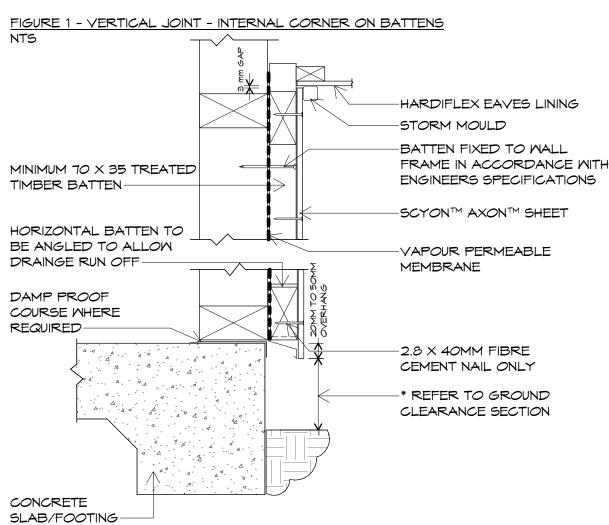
SLAB AND EAVE JUNCTION DETAIL ON BATTENS NTS
